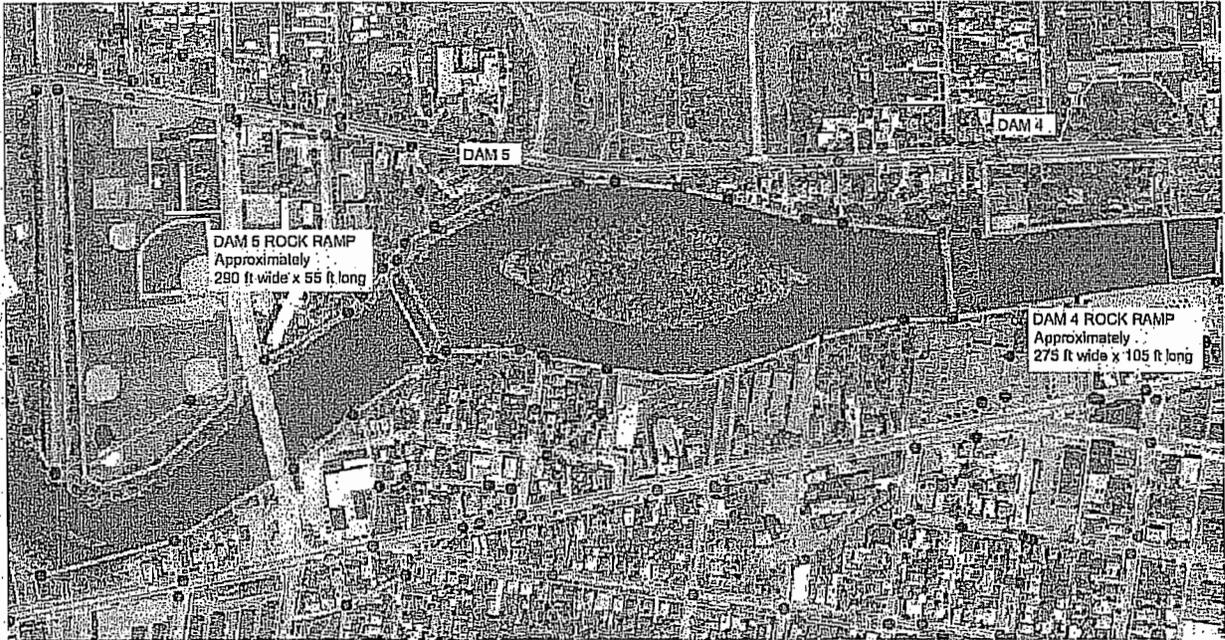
Proposed Locations of Rock Ramps or Rock Arch Rapids at Dam 4 and Dam 5
